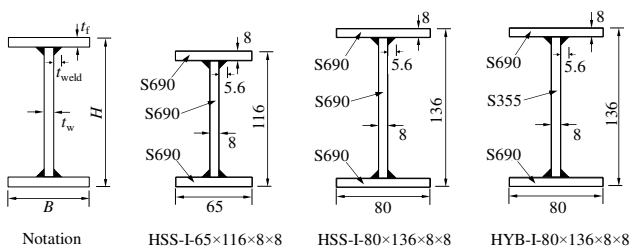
Notation and nominal dimensions of the three investigated welded I-sections (dimensions in mm).
